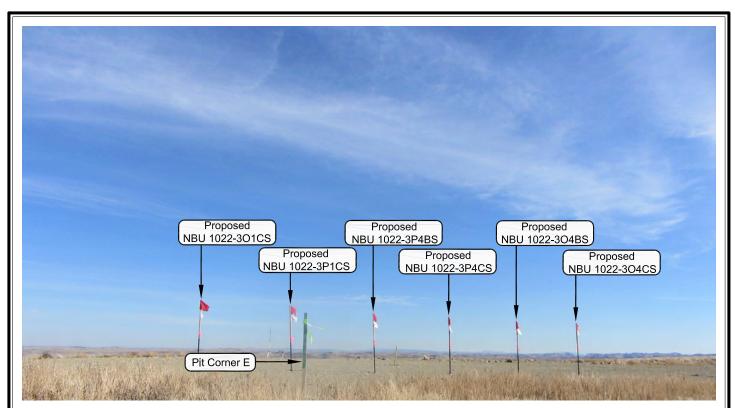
PHOTO VIEW: FROM PIT CORNER E TO LOCATION STAKE
